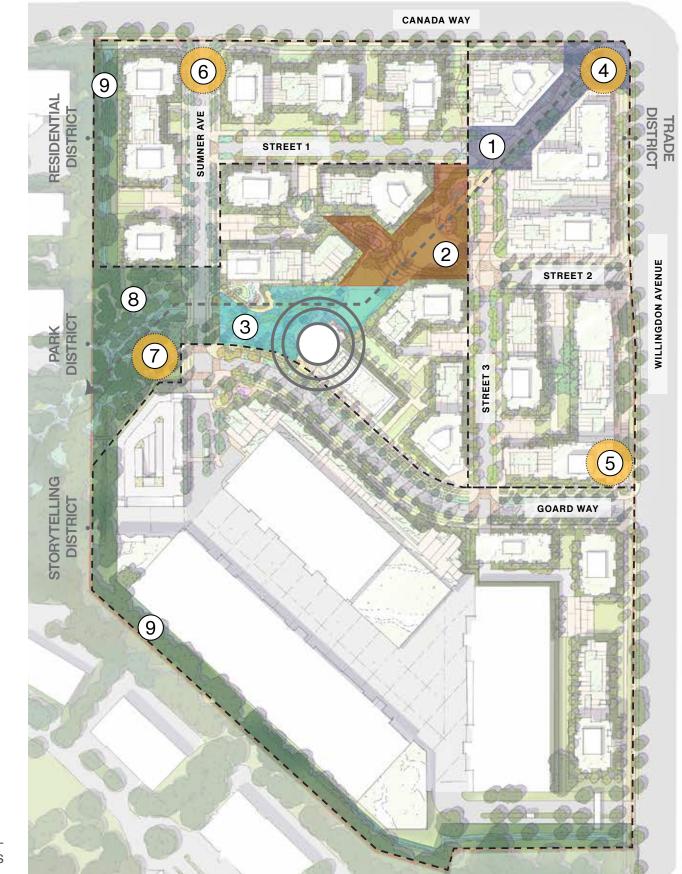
SITE PLAN -PUBLIC REALM ELEMENTS
